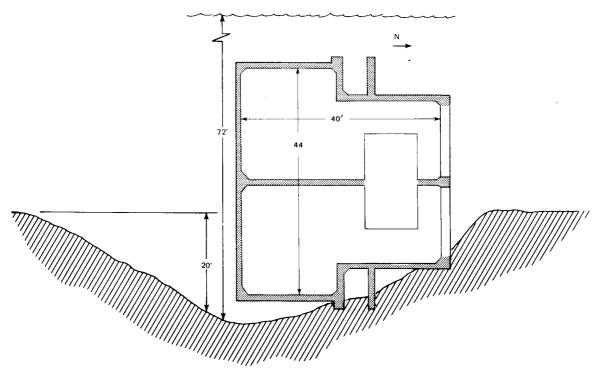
Western End Section of Concrete Caisson Showing Bottom Topography
